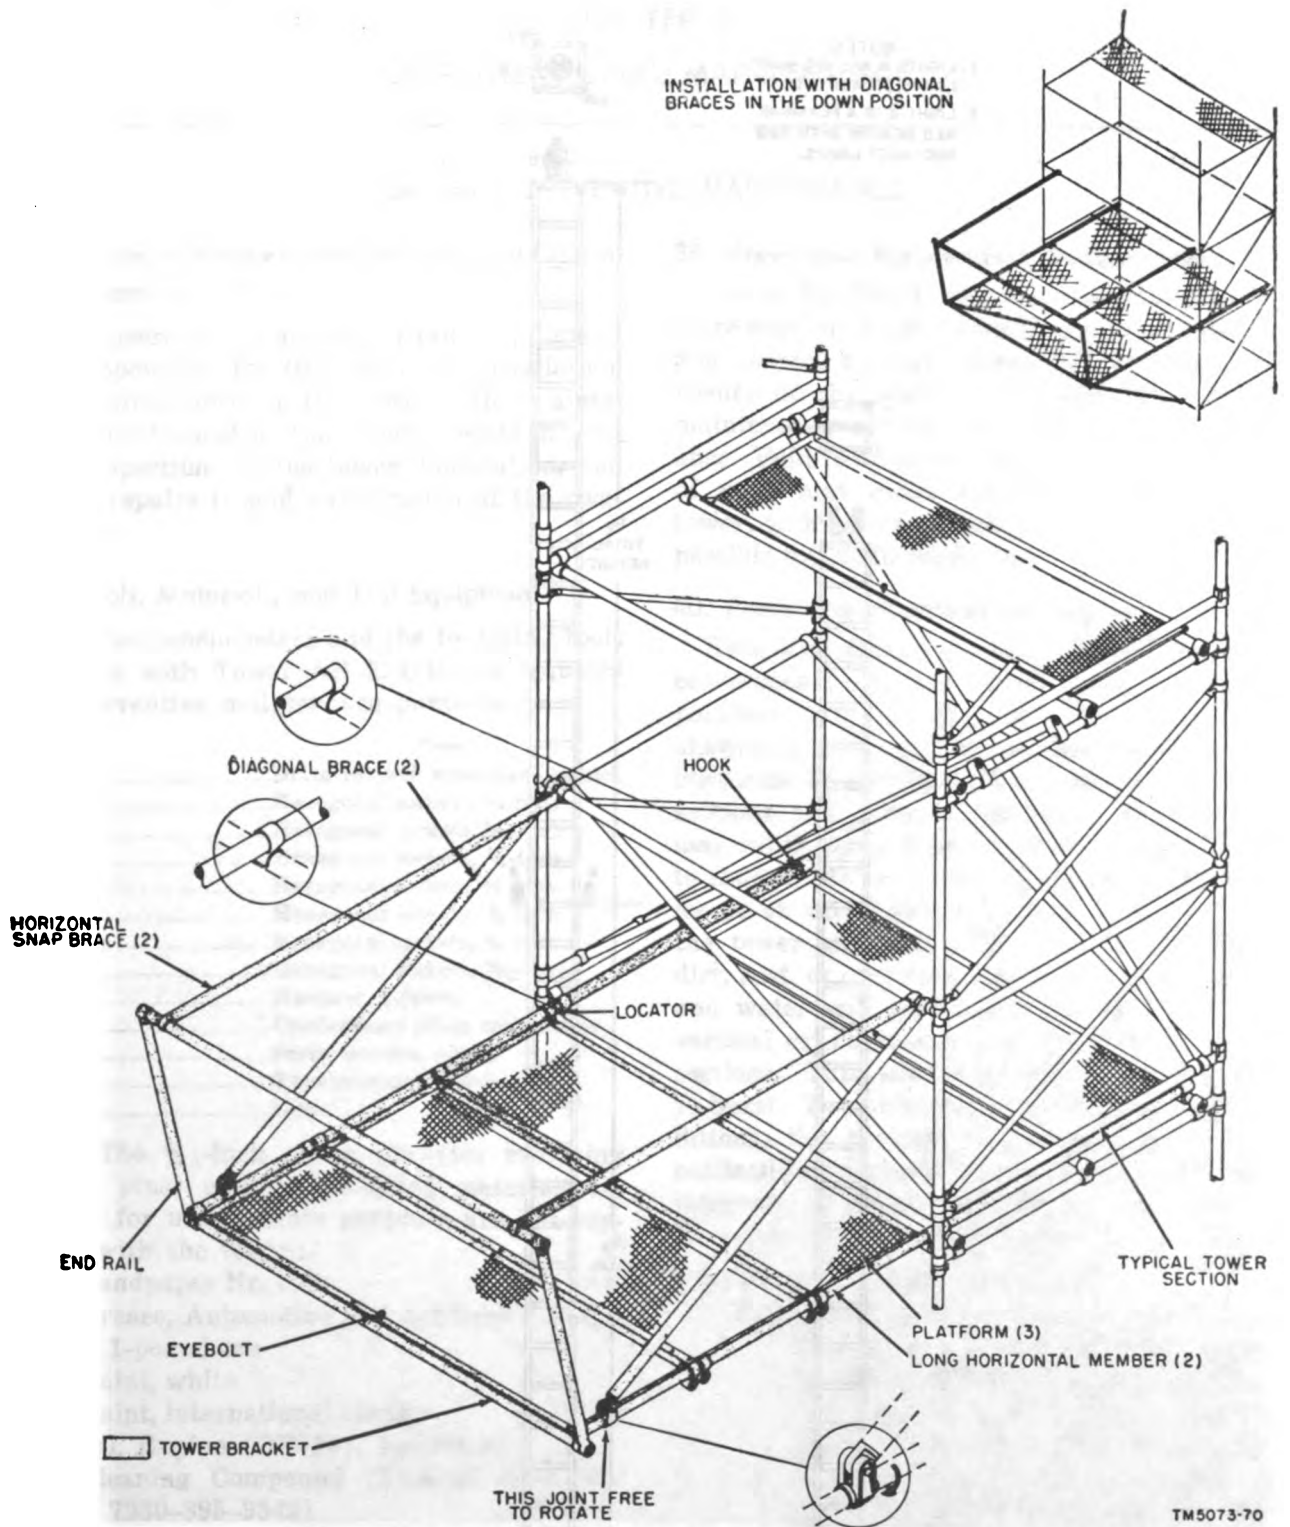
Installation of Scaffold Tower Bracket MT-1157/G.
